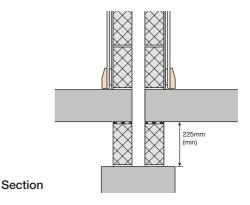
Ground floor junction detail from Robust Details Part E Handbook.
